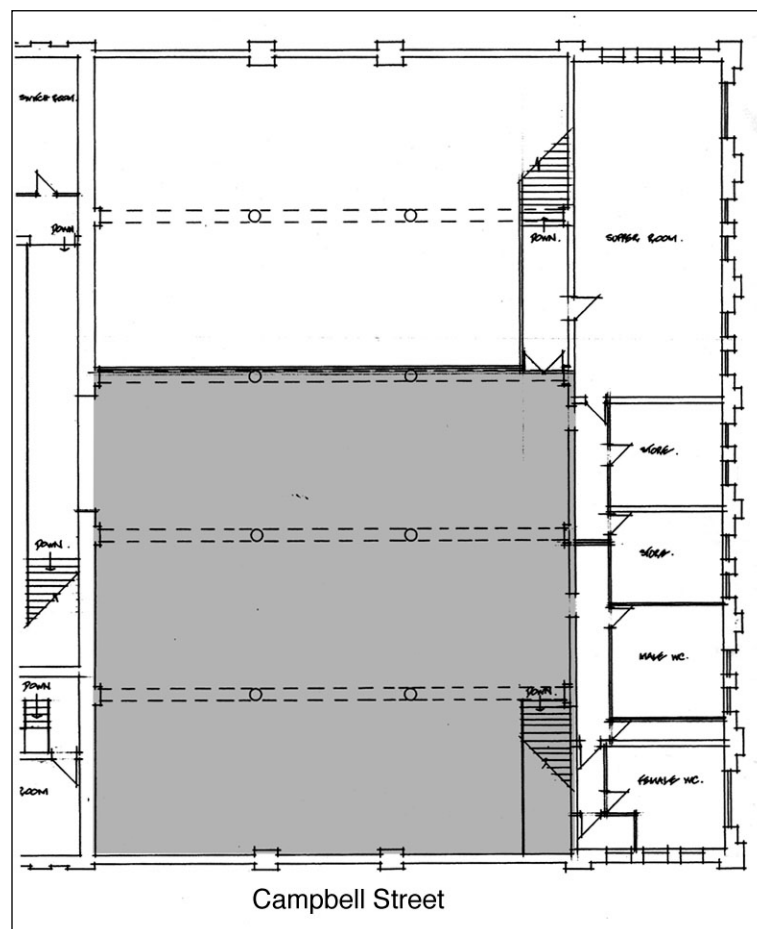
Detail of 1986 plan showing the dance studio (shaded) and supper room at the top right. Note also the wide doorway between the dance floor and the main auditorium (HCC 8605-01).
